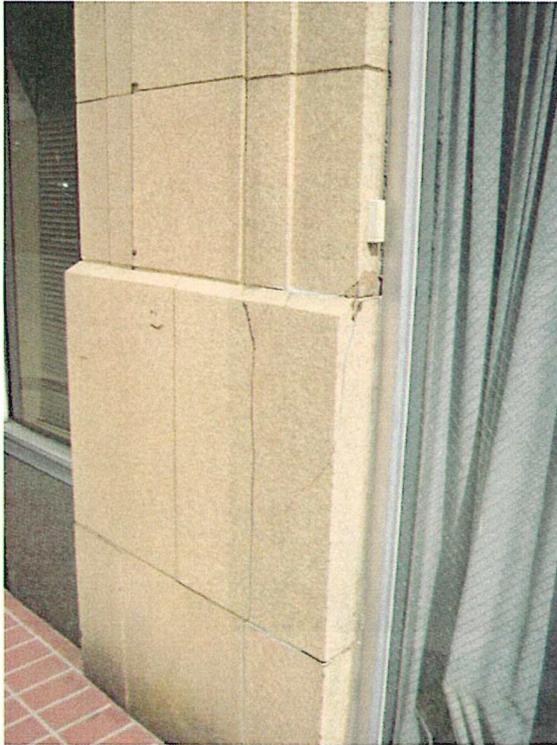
Detail of terra cotta surround at store front. Note cracks in lower blocks.
